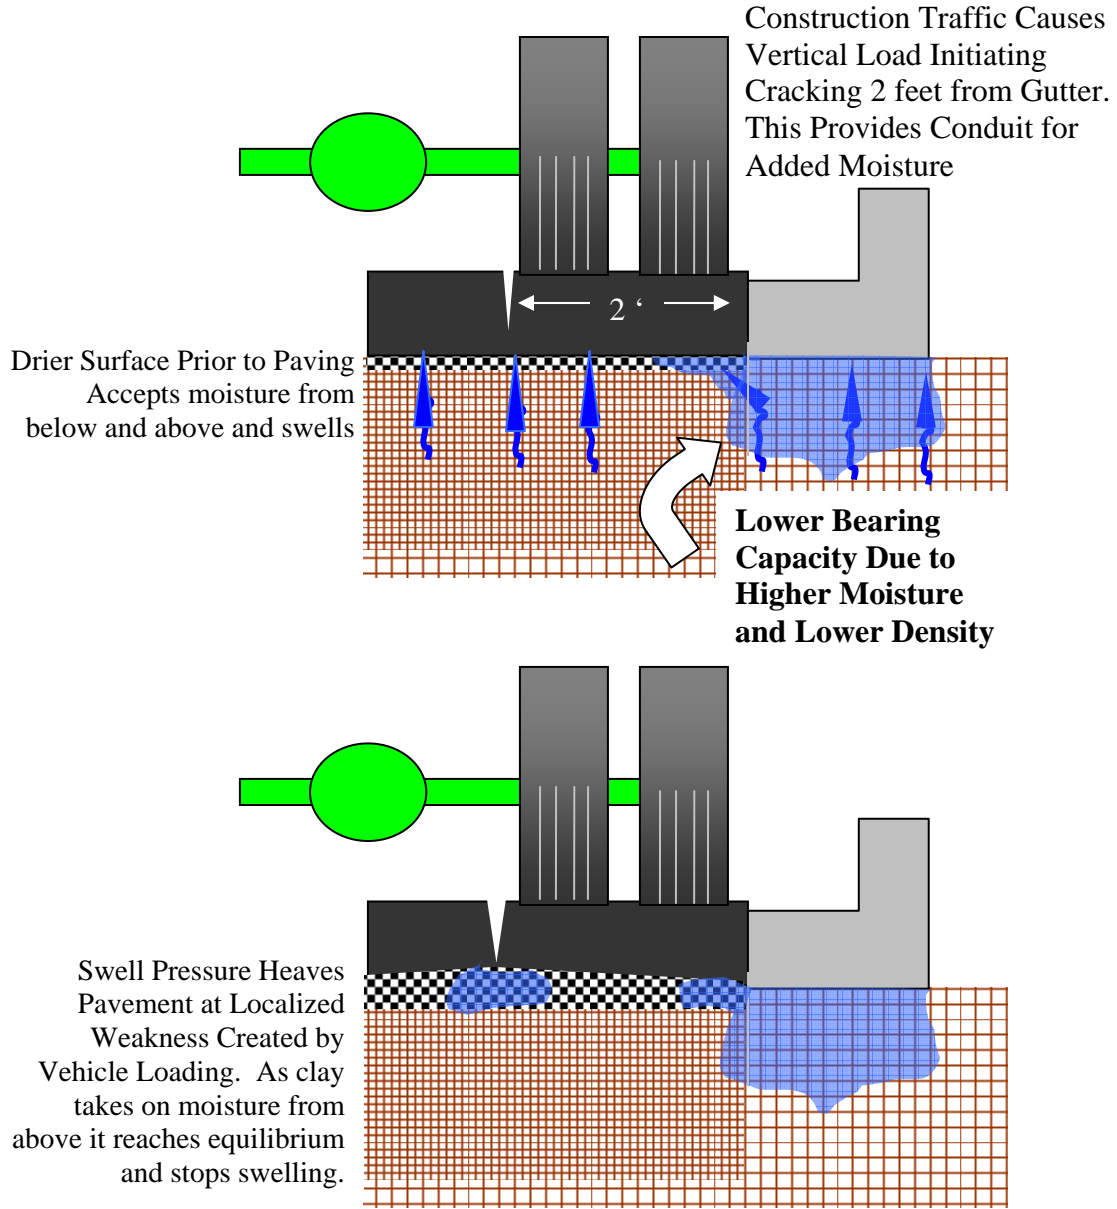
One Possible Mechanism for Edge Cracking in Full-Depth Sections
